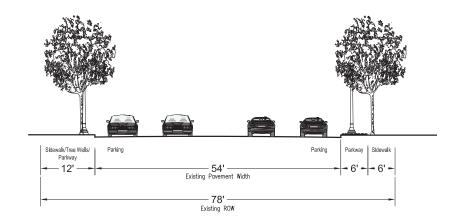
TYPICAL SECTION - RESIDENTIAL STREET
